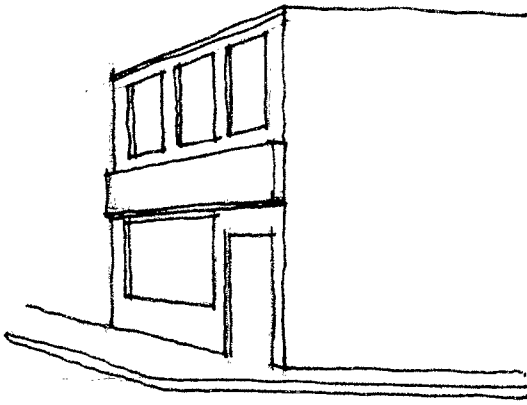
A simple commercial building which has been stripped of its historic features, by new windows, storefront, signage and cladding.
